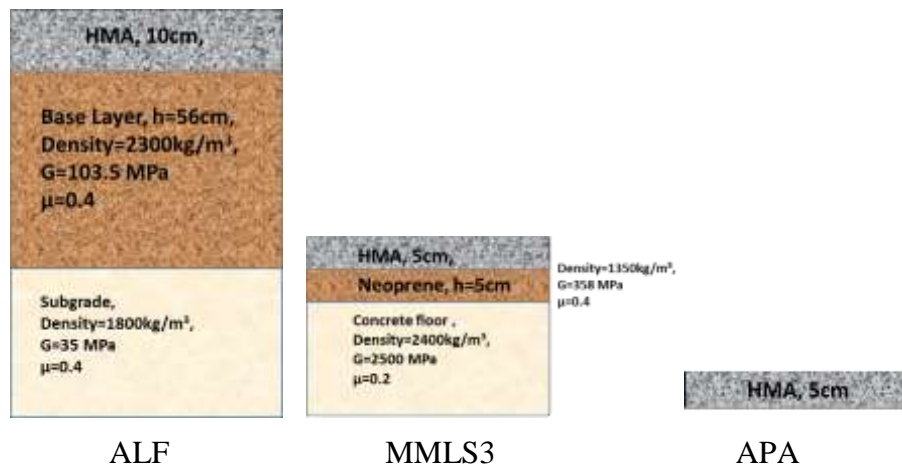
Layout of ALF test lane, MMLS3 test lift and APA specimen
